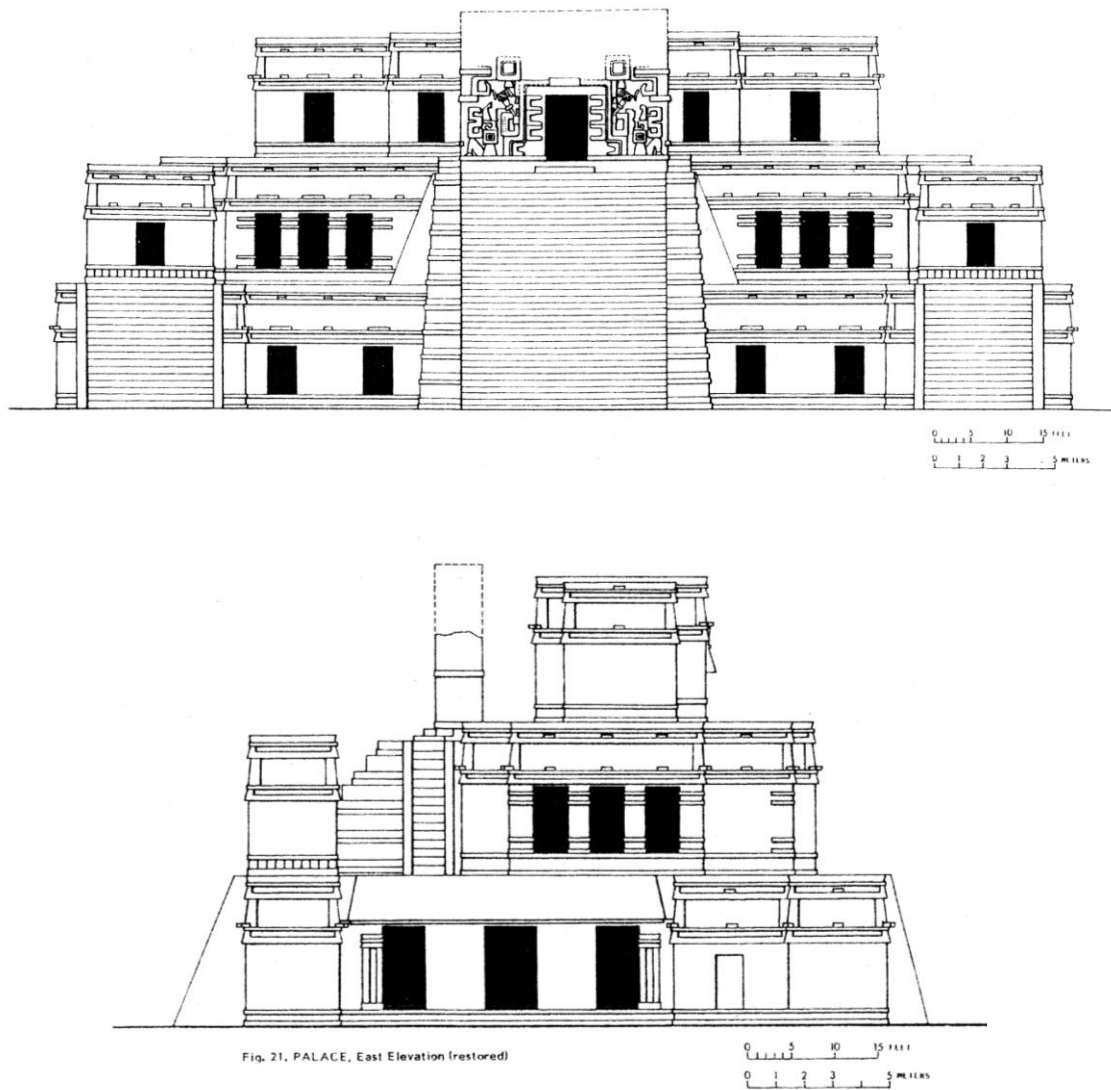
South (above) and East (below) elevation of the palace at Santa Rosa Xtampak (Andrews 1995a: 84)
